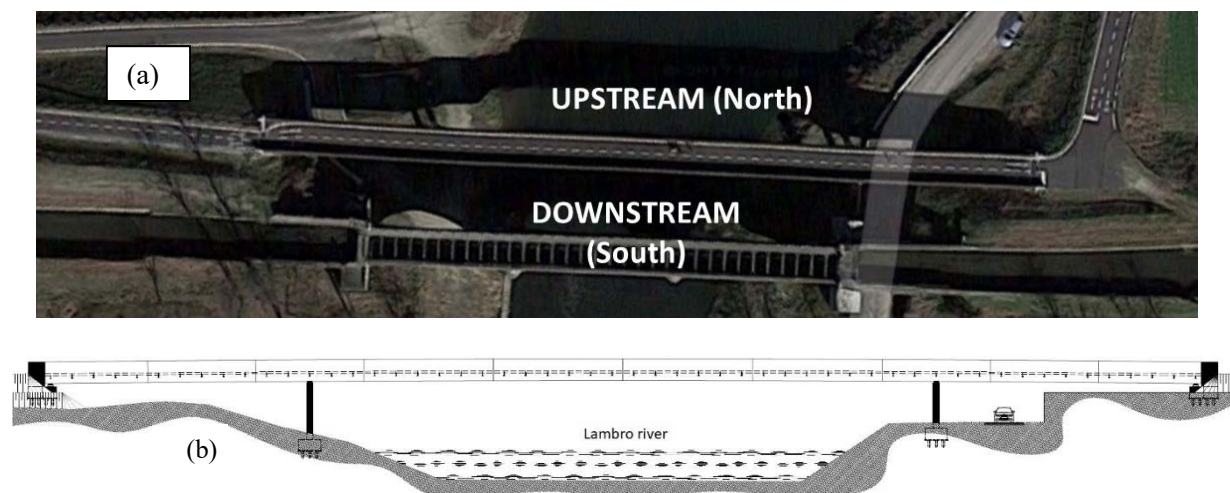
Lambro footbridge: (a) aerial view; (b) side view (adapted from [14]).
